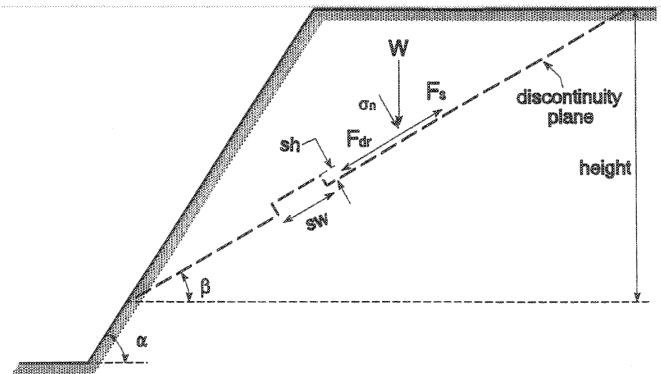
Cross-section of a slope with one step on a discontinuity plane.
